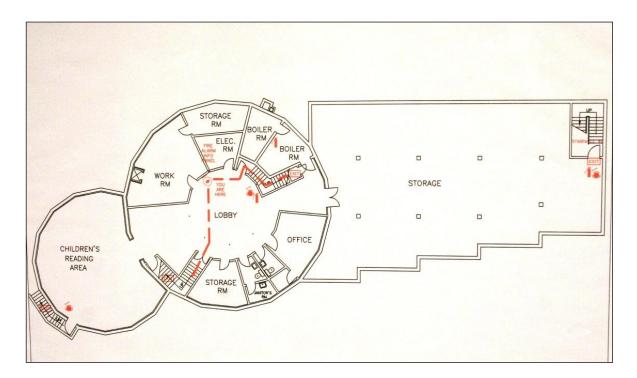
St. Vital Library, 6 Fermor Avenue, plan of basement. (Courtesy of St. Vital Library.)
